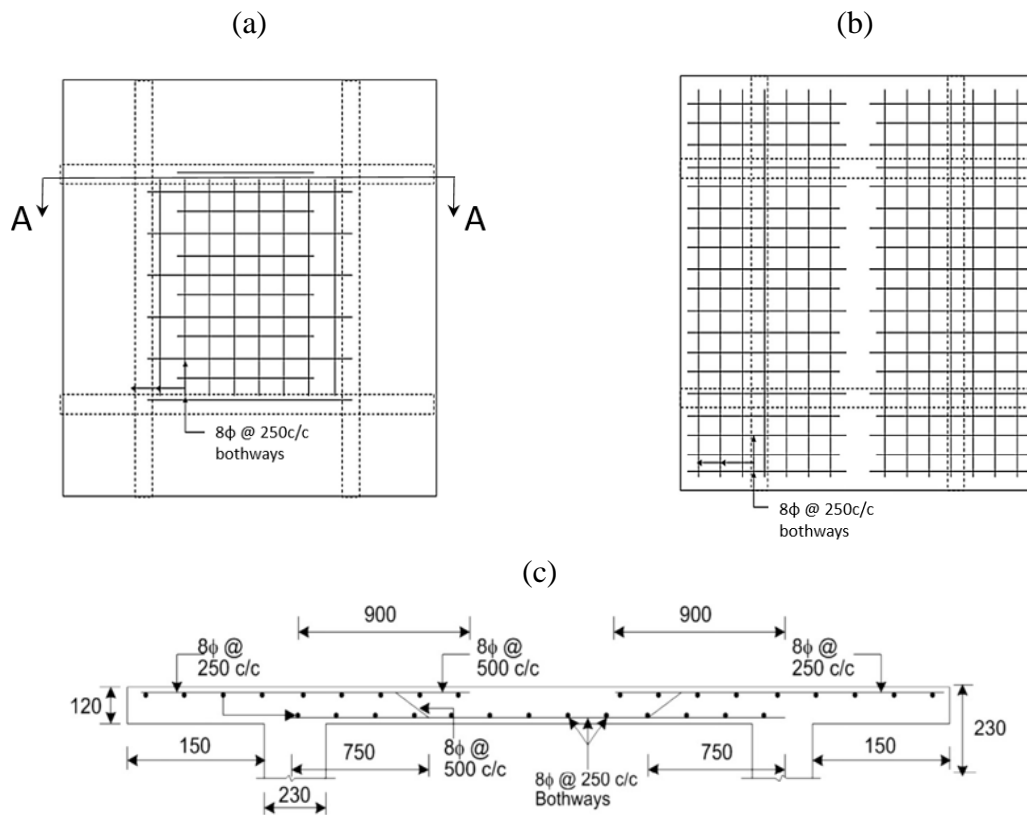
Reinforcement details in: (a) Top reinforcement of the slab, (b) bottom reinforcement of the slab and (c) transversal slab cross-section (Shah et al., 2017).
